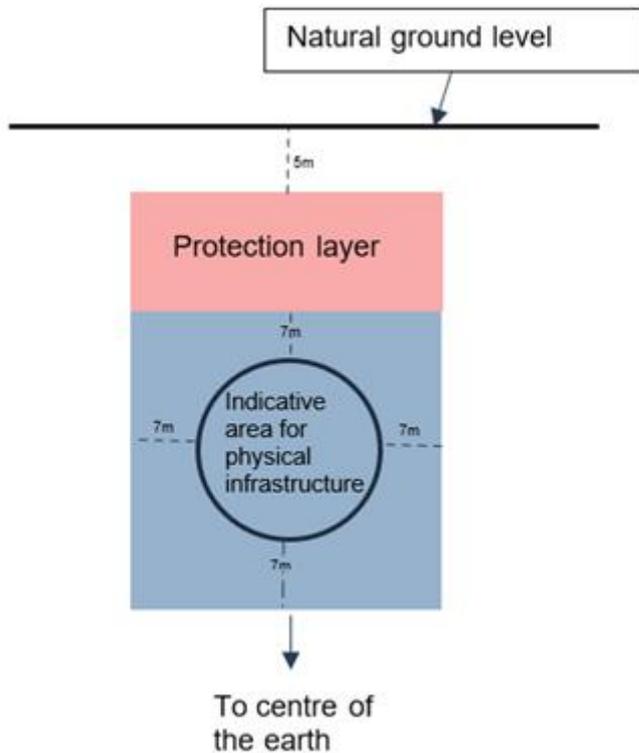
Tunnel cross-section diagram showing NoR 1 and 2
